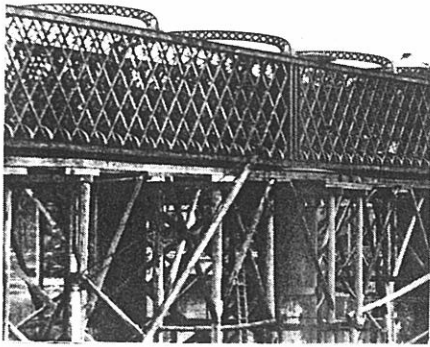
Connections of cross-girder to bottom chords, side and top connections.
